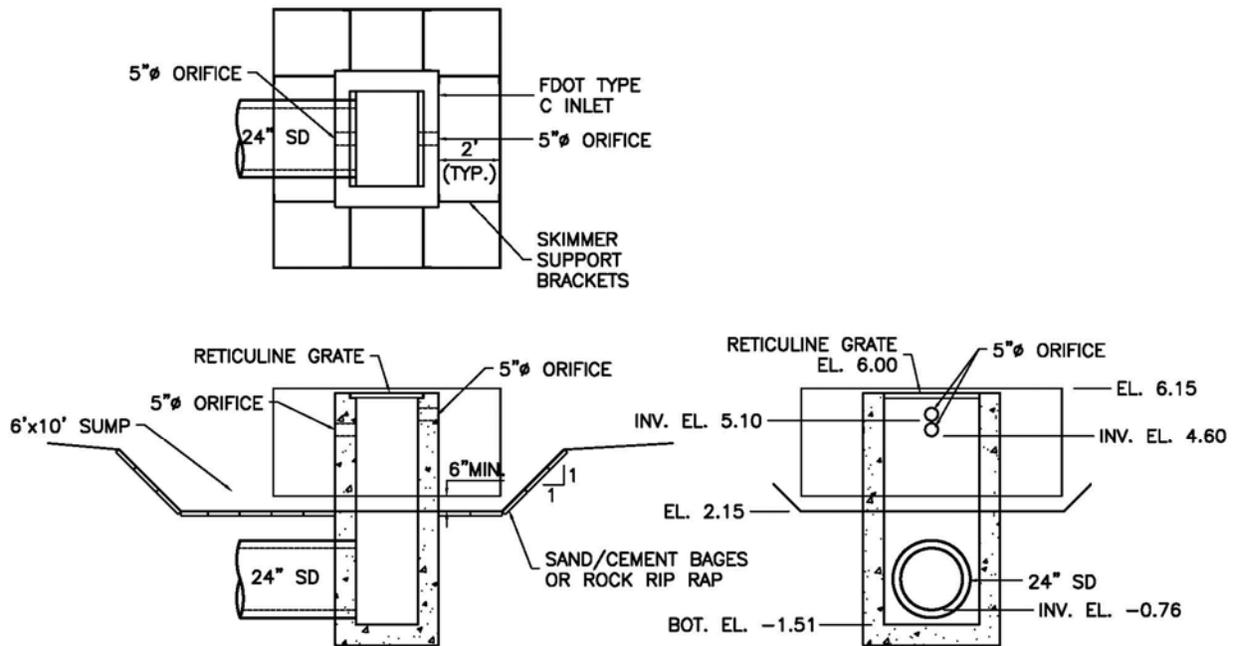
Overview of Outfall Structure 1 at the Naples Dry Detention Site.
